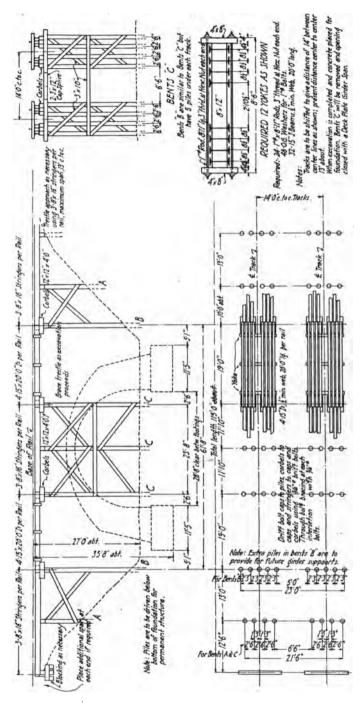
Fig. A. Temporary Structure, Elimination of Grade Crossings, B. & O. R. R.
